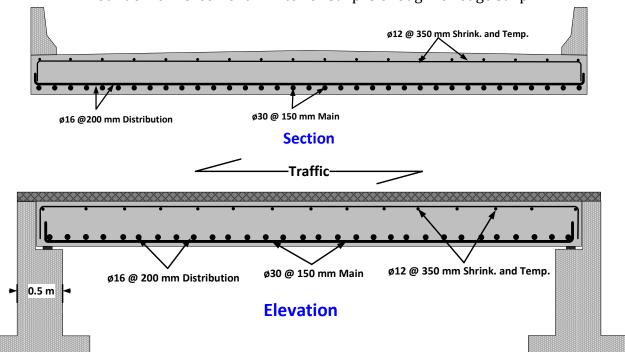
Reinforcement for the Slab Bridge of Example 6.1
